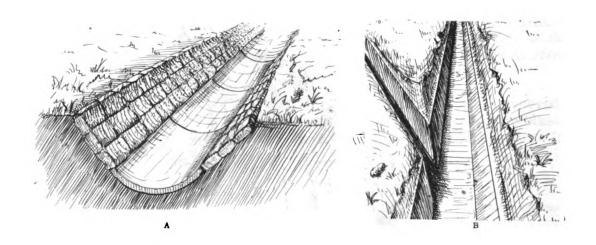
Ditch linings. A. Concrete invert lining and grass sodding. B. Full concrete lining.
